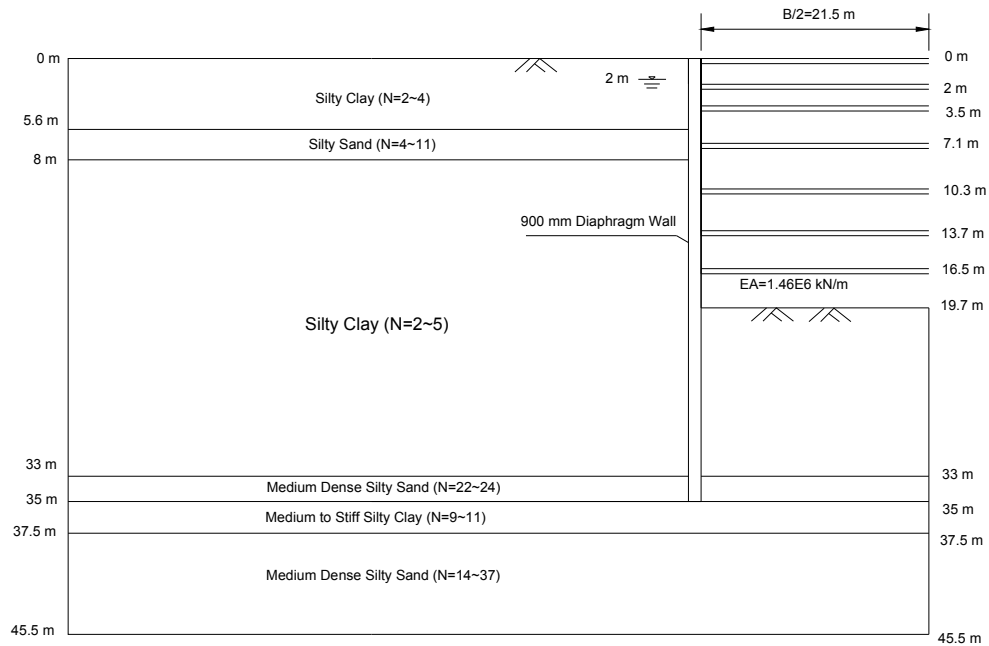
Cross-Section of Excavation at TNEC Project (Halim, 2008)
